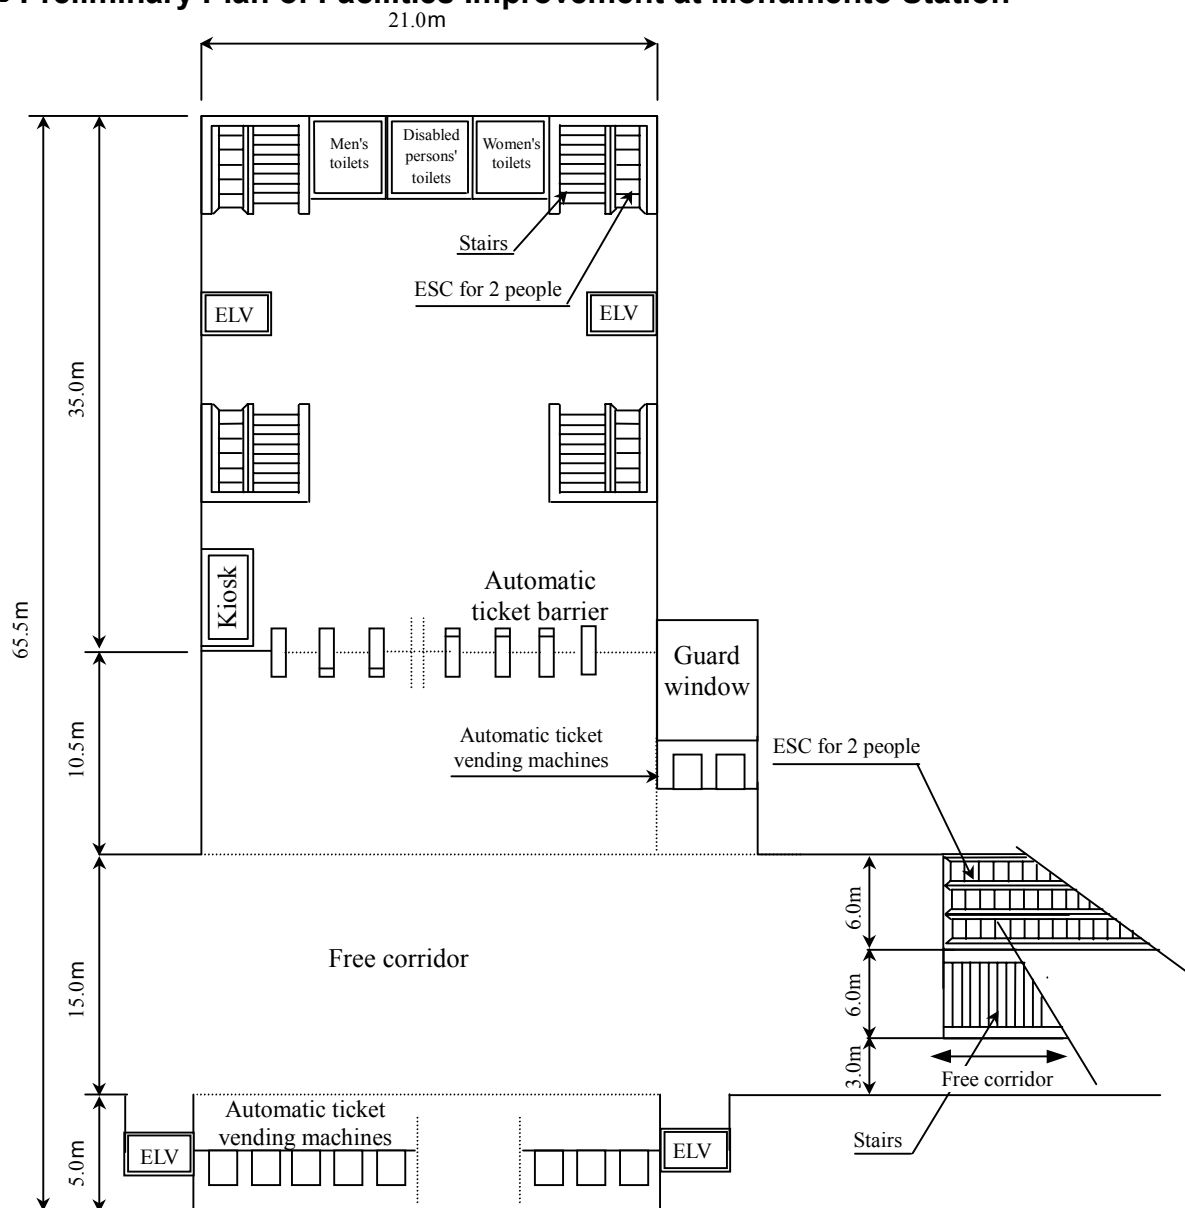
Preliminary Plan of Facilities Improvement at Monumento Station
